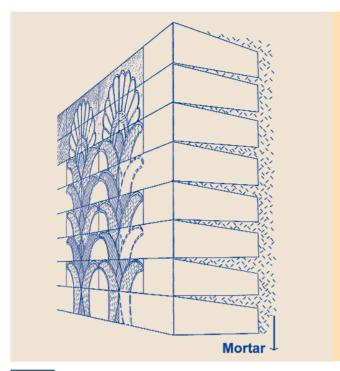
A section of a glazed brick frieze with a provided space for mortar; drawing by Sh. Razmjou.
